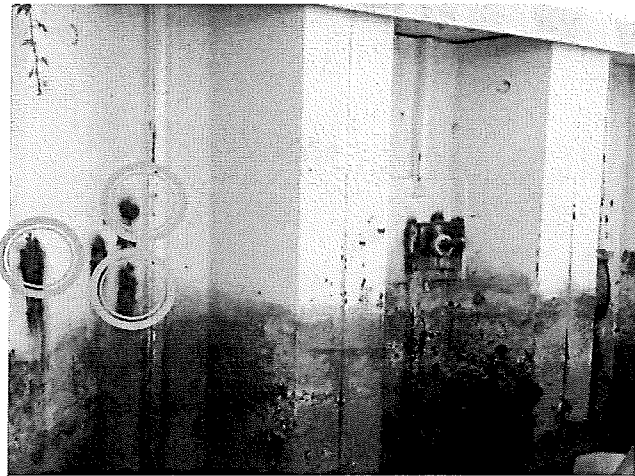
Pinholes in the wall. Also rust in the tieback has developed.
